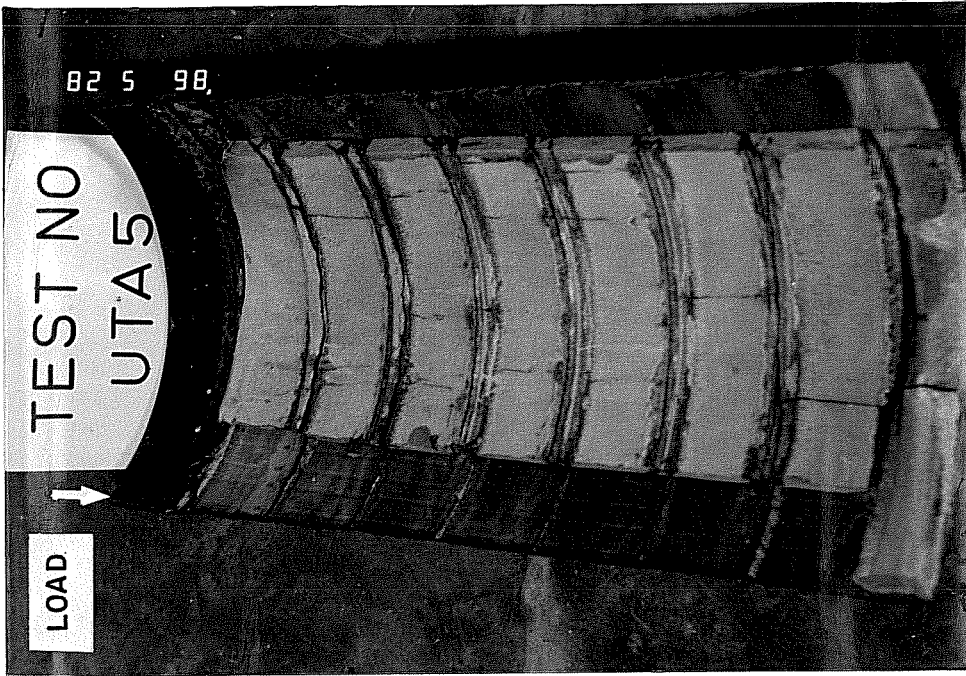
Grout surface on pile side for Specimen UTA5
